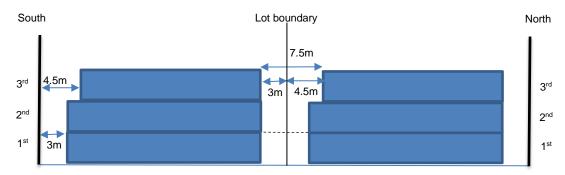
Example of side building setback. Front view showing side setback (where building length is less than 16m).
